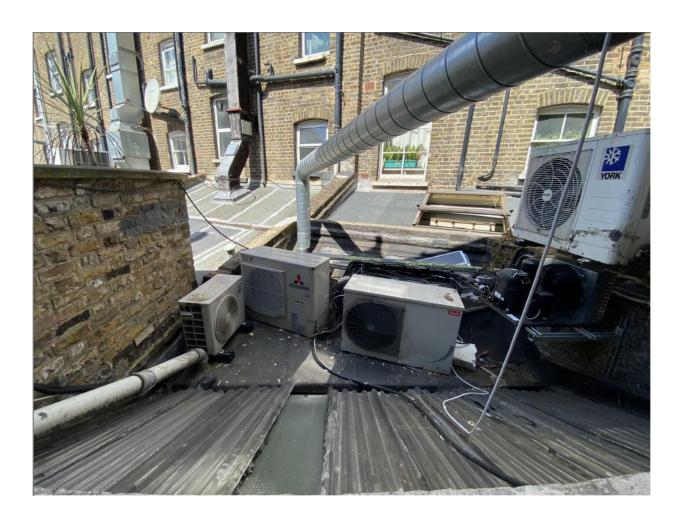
(above): Photo taken from the Lamb's Conduit Passage side of the site showing existing plant
